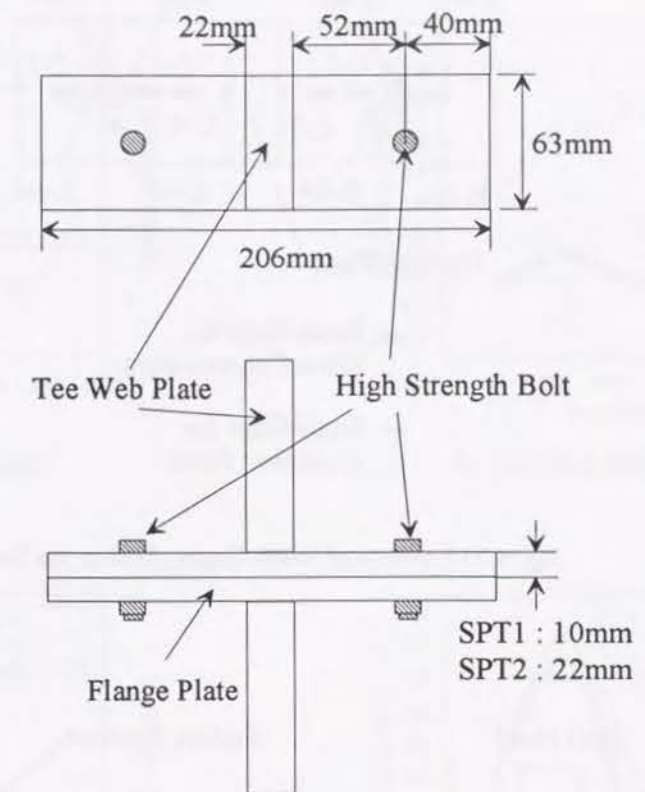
Dimensions of the Specimens for the Fatigue Test
